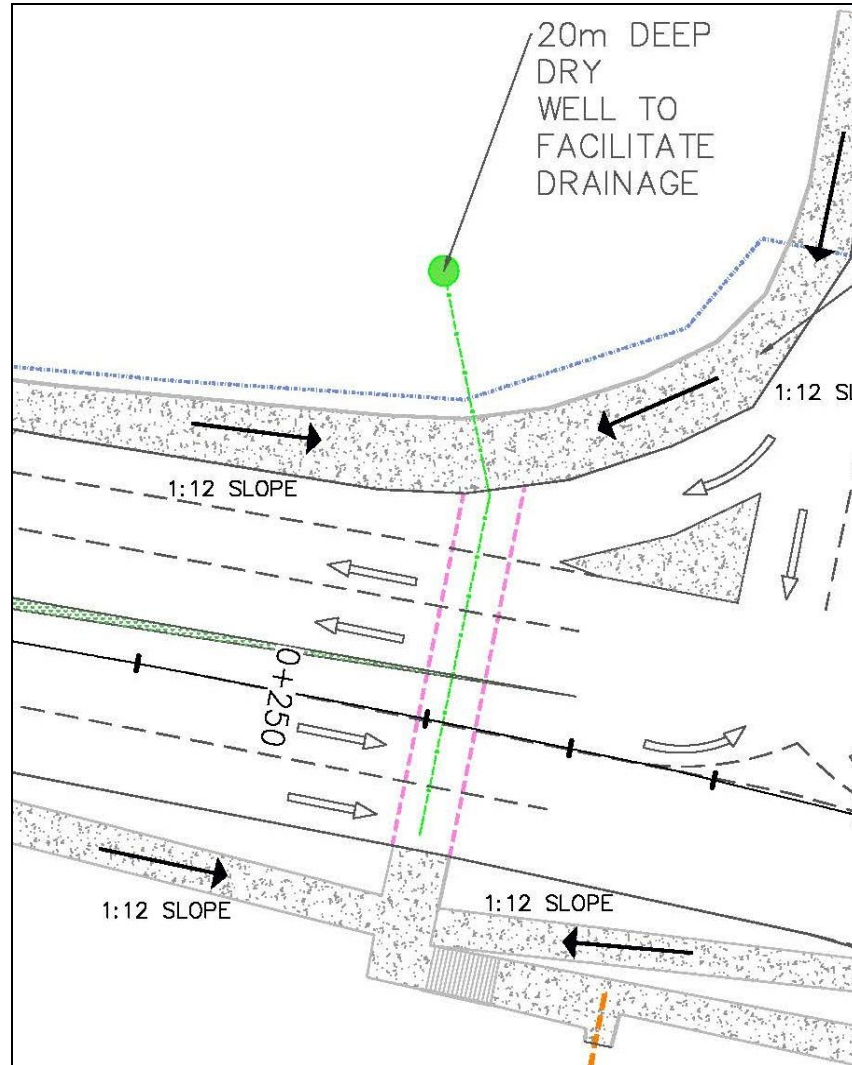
Underpass Drainage Pipes and Location of Dry Well
